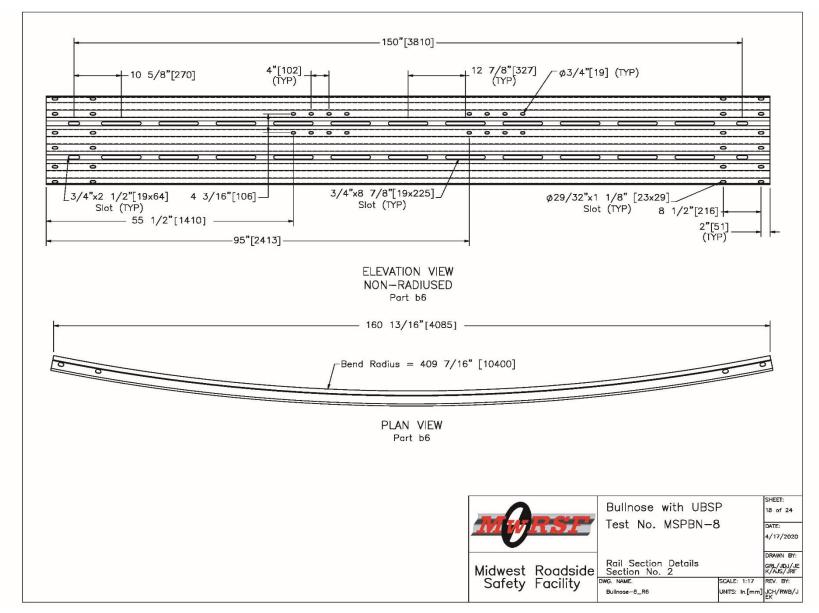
Rail Section Details, Section No. 2, Test No. MSPBN-8
